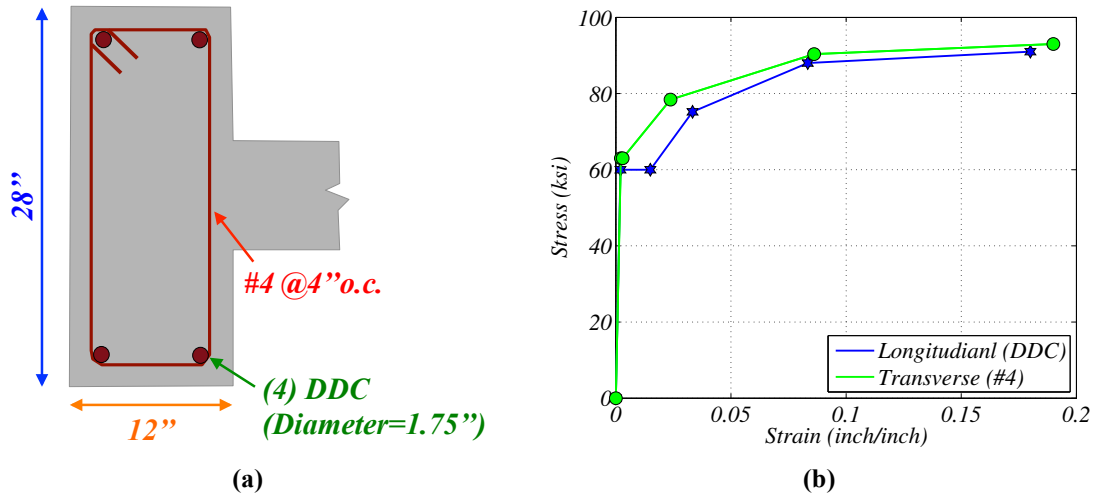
Beam installed at the fourth floor: (a) geometry and (b) model of longitudinal and transverse steel
